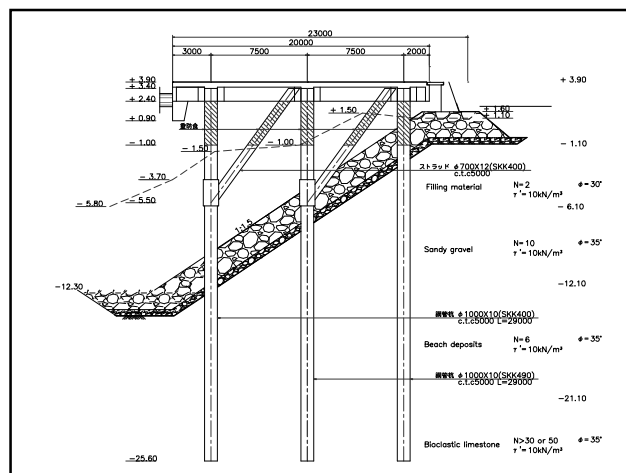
Typical Cross Section of Wharf Structure with Struts
